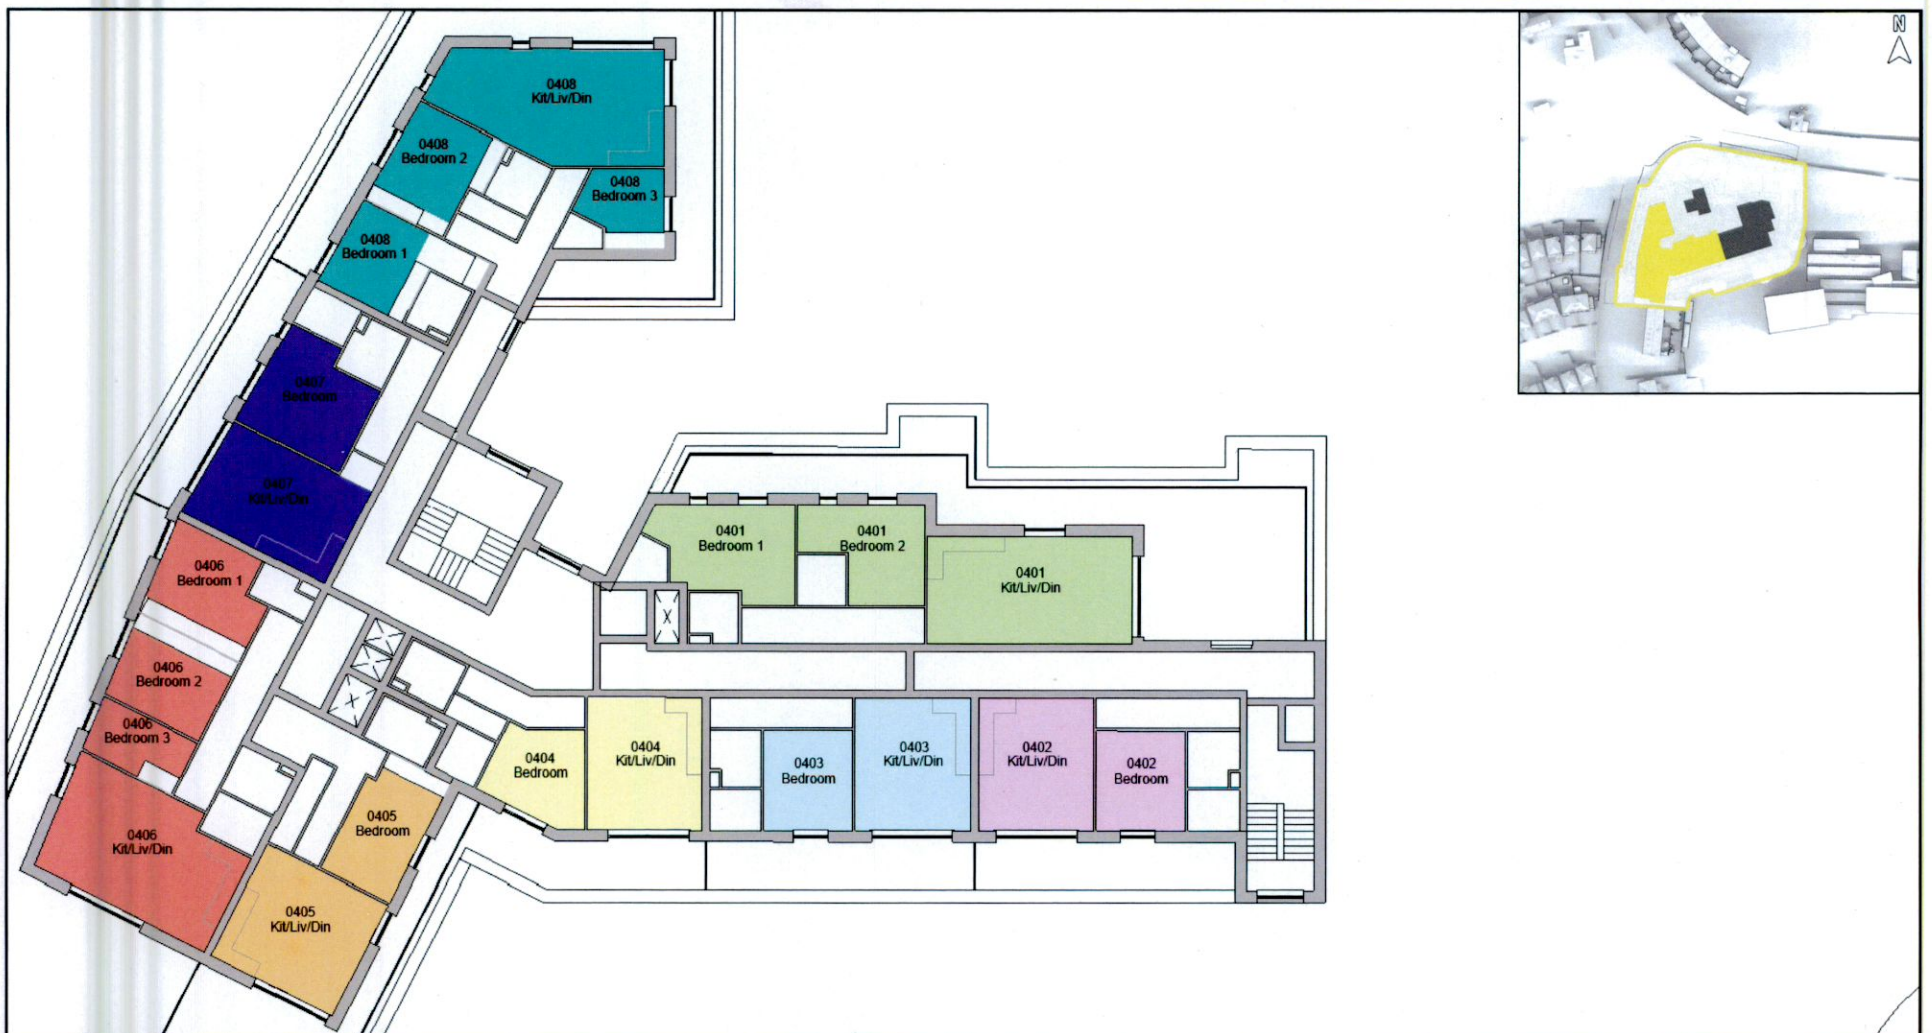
Floor plan of assessed building (L), Keyplan highlighting the assessed building (R).
